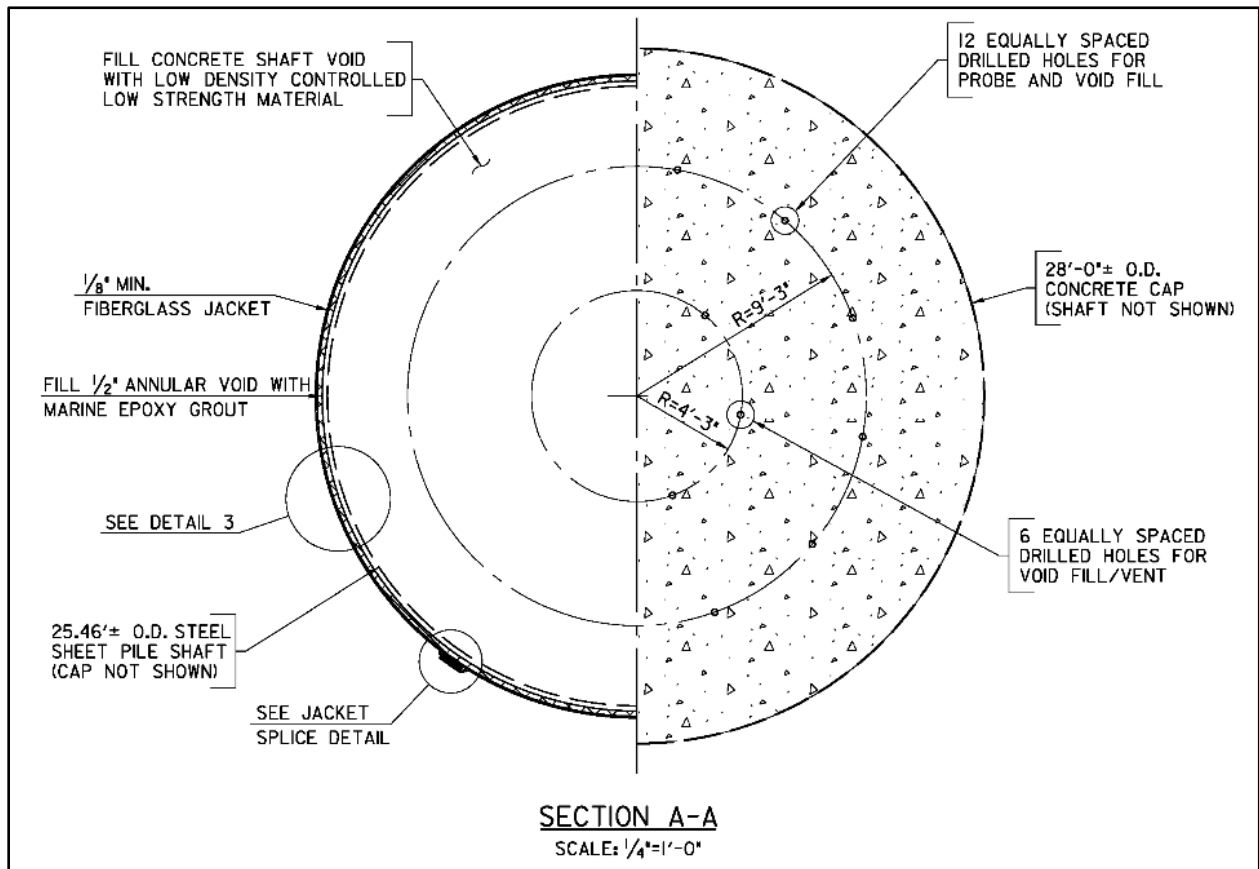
Typical plan view of a Key Bridge dolphin. (Source: MDTA)
